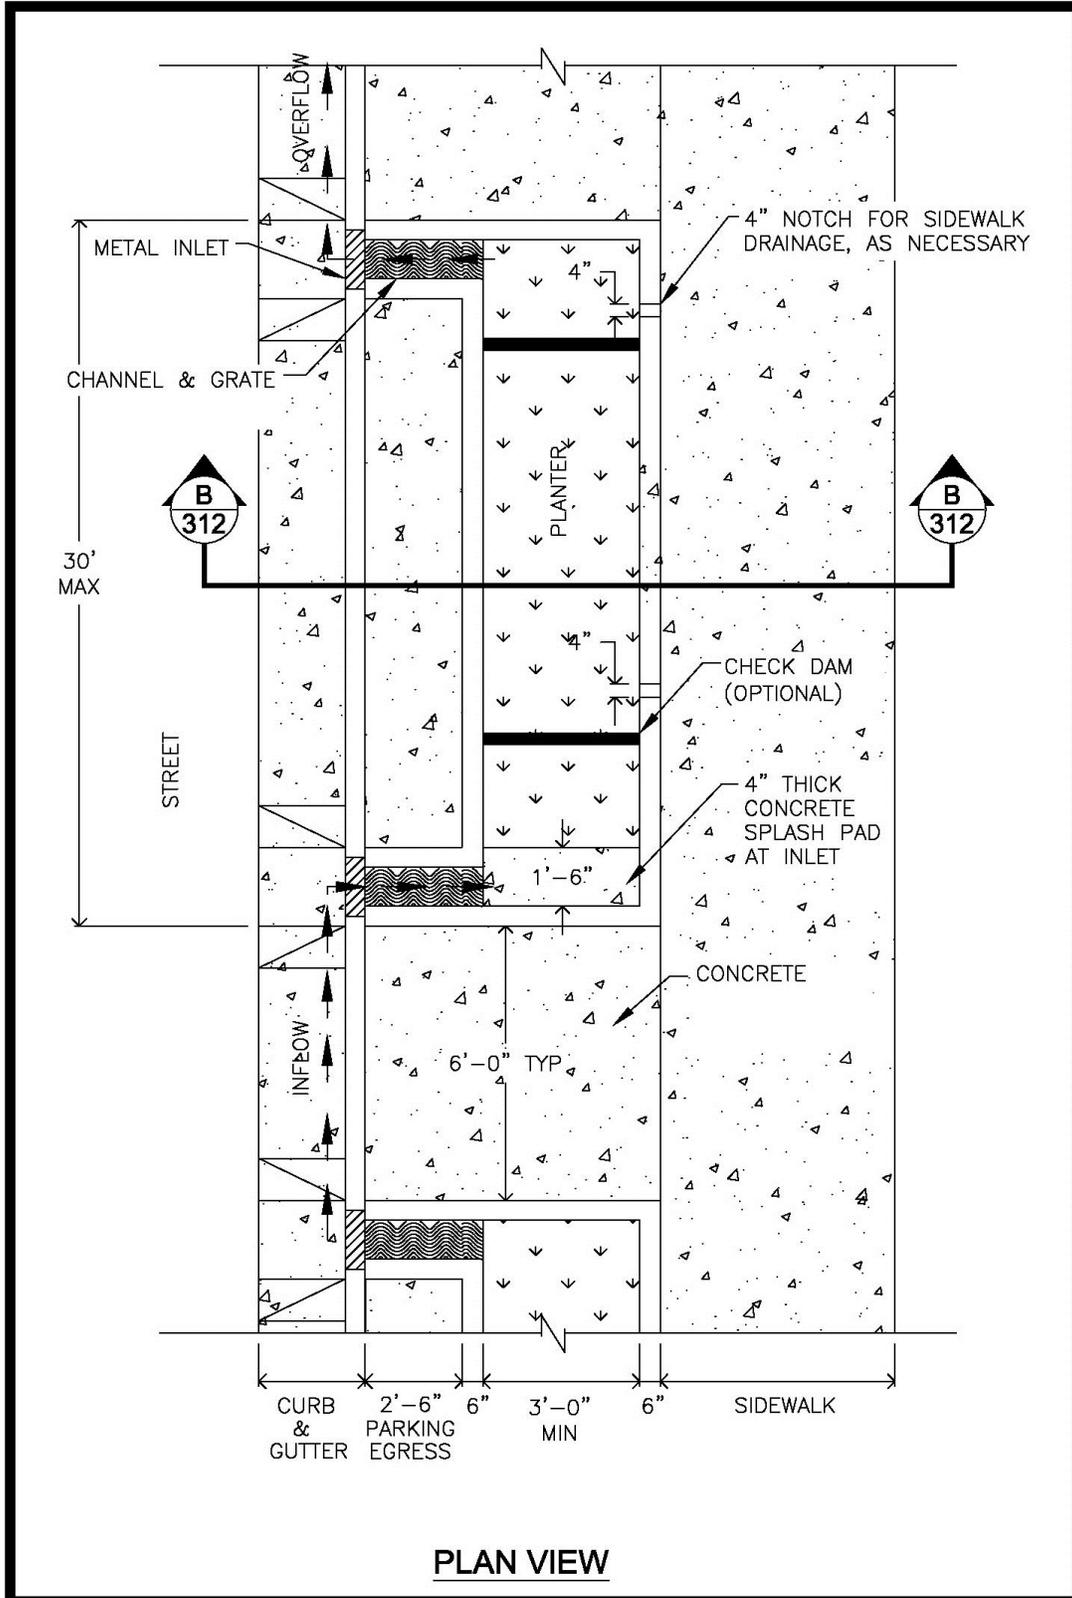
Green Streets Planter Plan View with Parking (source: Portland, 2011)
